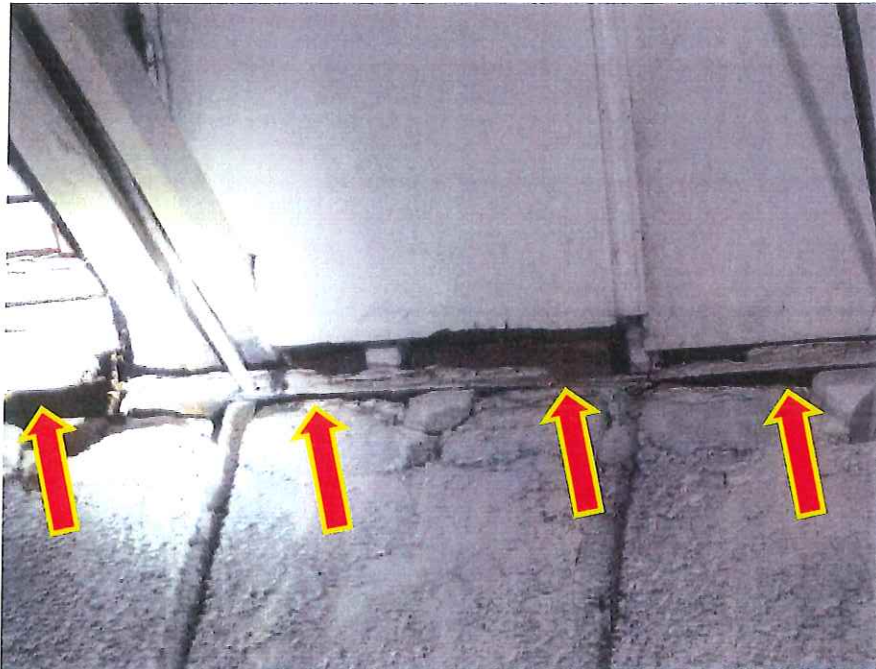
Timber wall plate and rafters decaying, this is typical of most areas at eaves level and in other areas.
